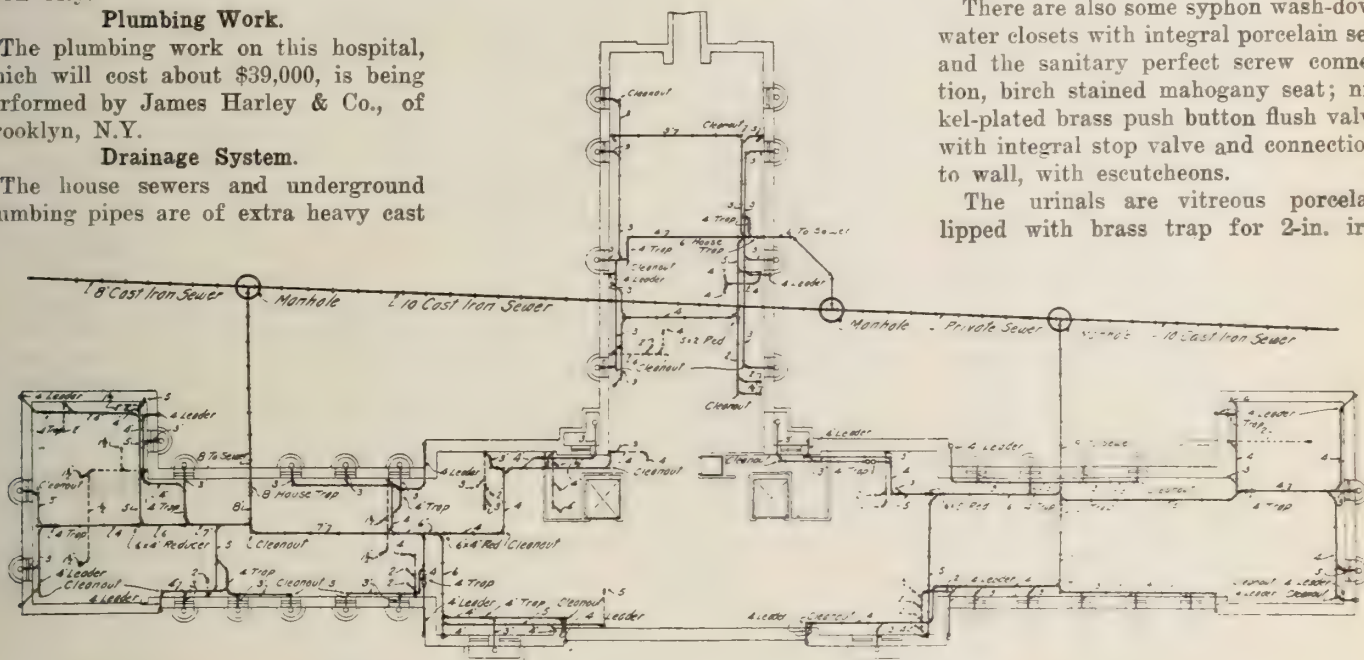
Basement Plans of Drainage and Private Sewer.
